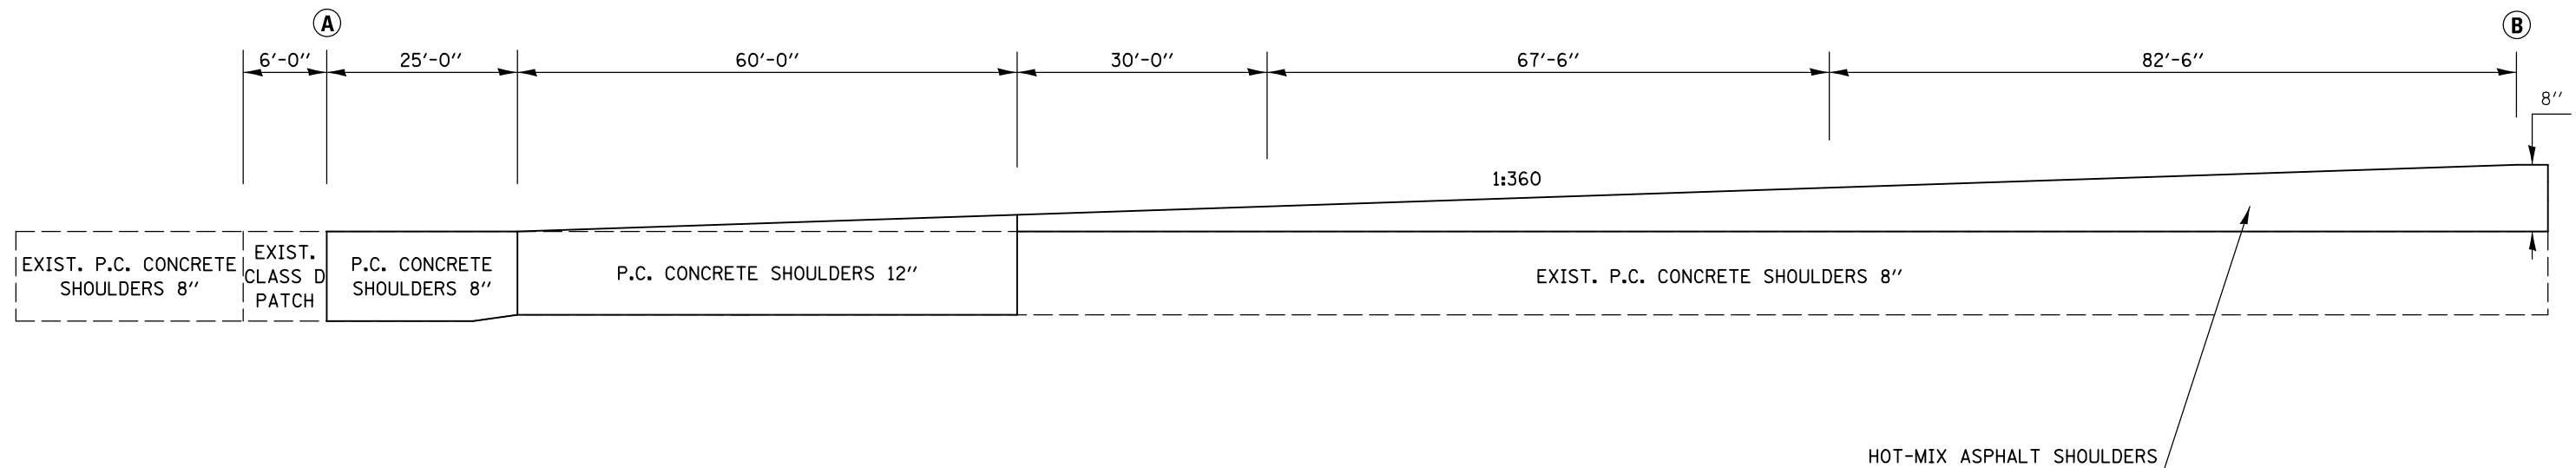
PATCHING AND PAVING TRANSITIONS
